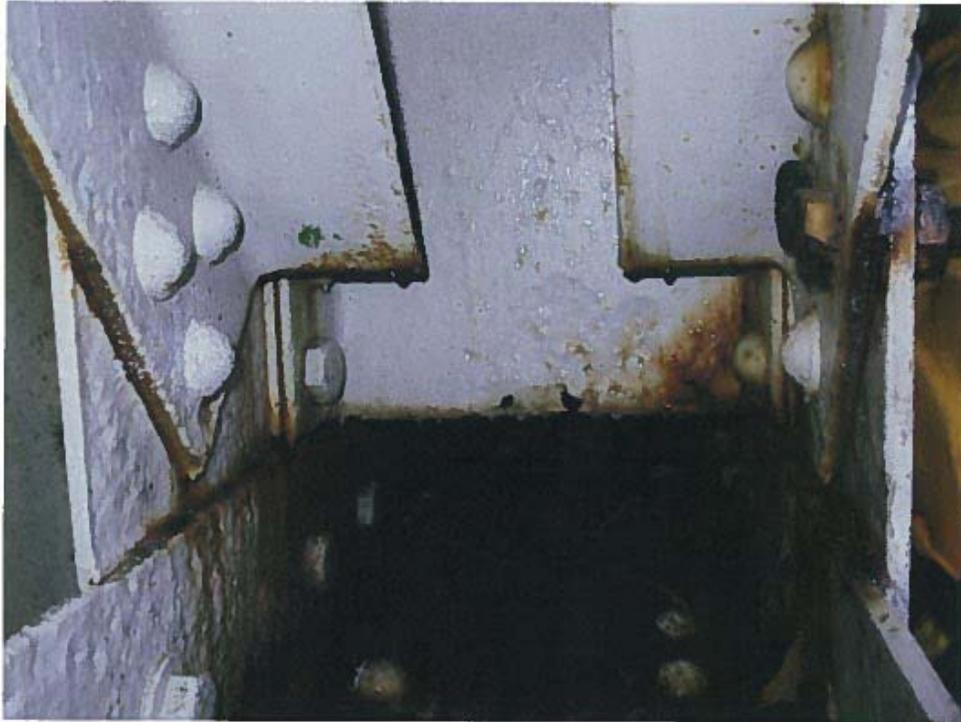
Lacing bars along top chord at south truss. Note: Section loss at lacing bars.
